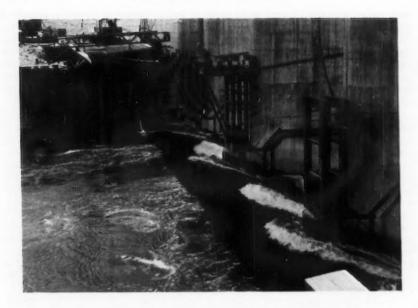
STRUCTURAL STEEL BRACKETS AND THE TIE BACKS AROUND THE SPILLWAY PIERS
